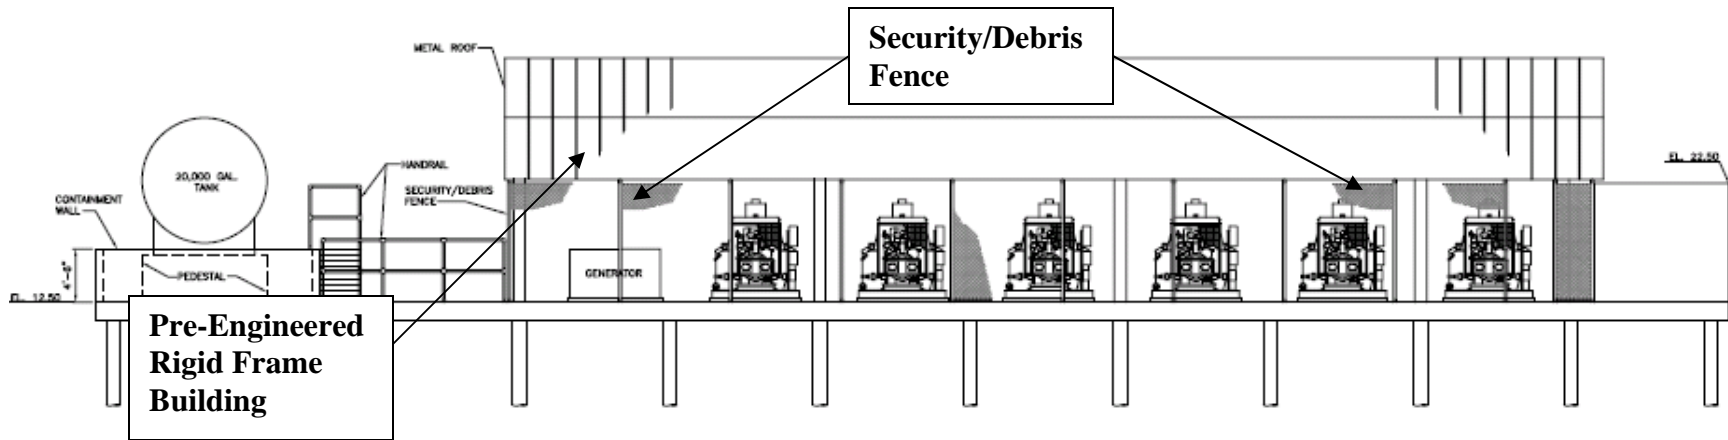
17th Street Phase 1 West Engine Platform Elevation
